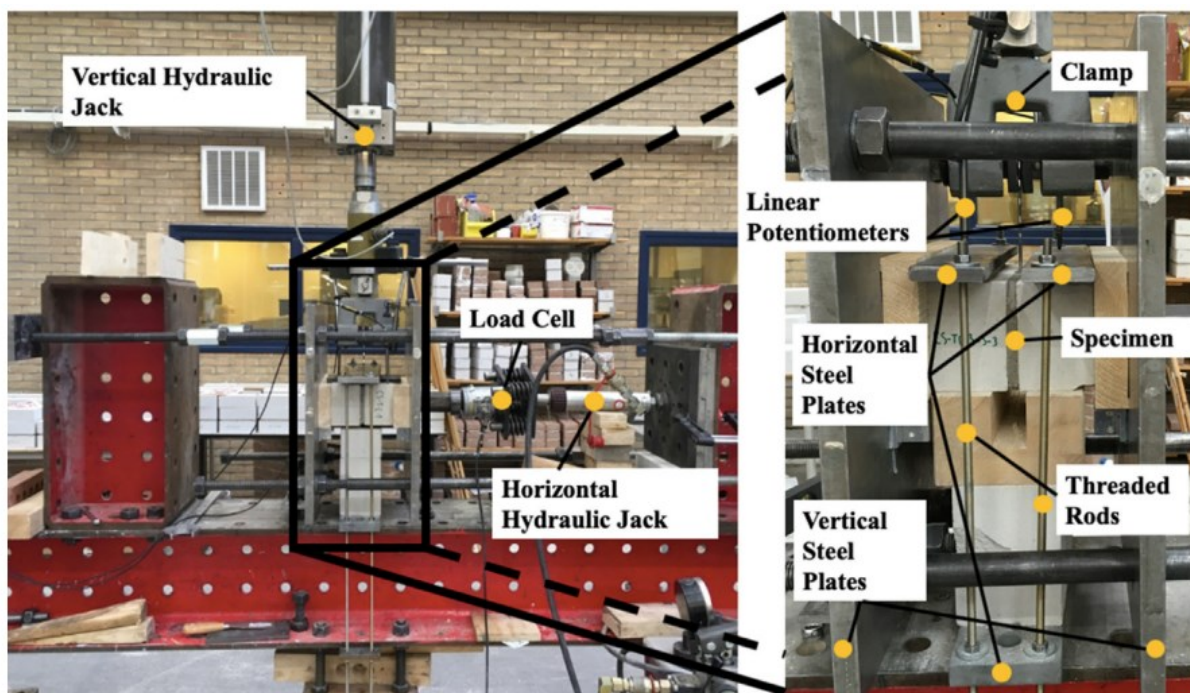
Tension and compression test setup for connectors (Arslan et al. 2020)
